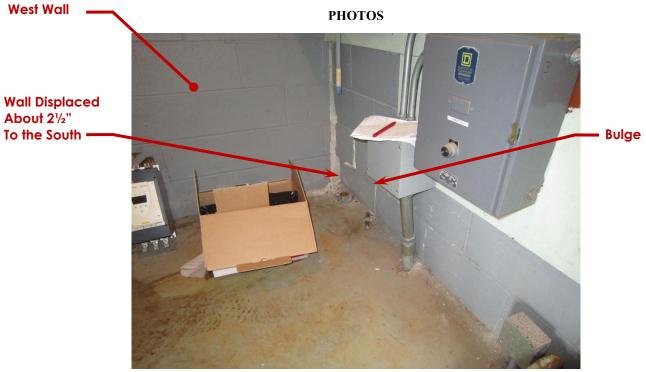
Base of Control Room North Wall (Northwest Corner)
